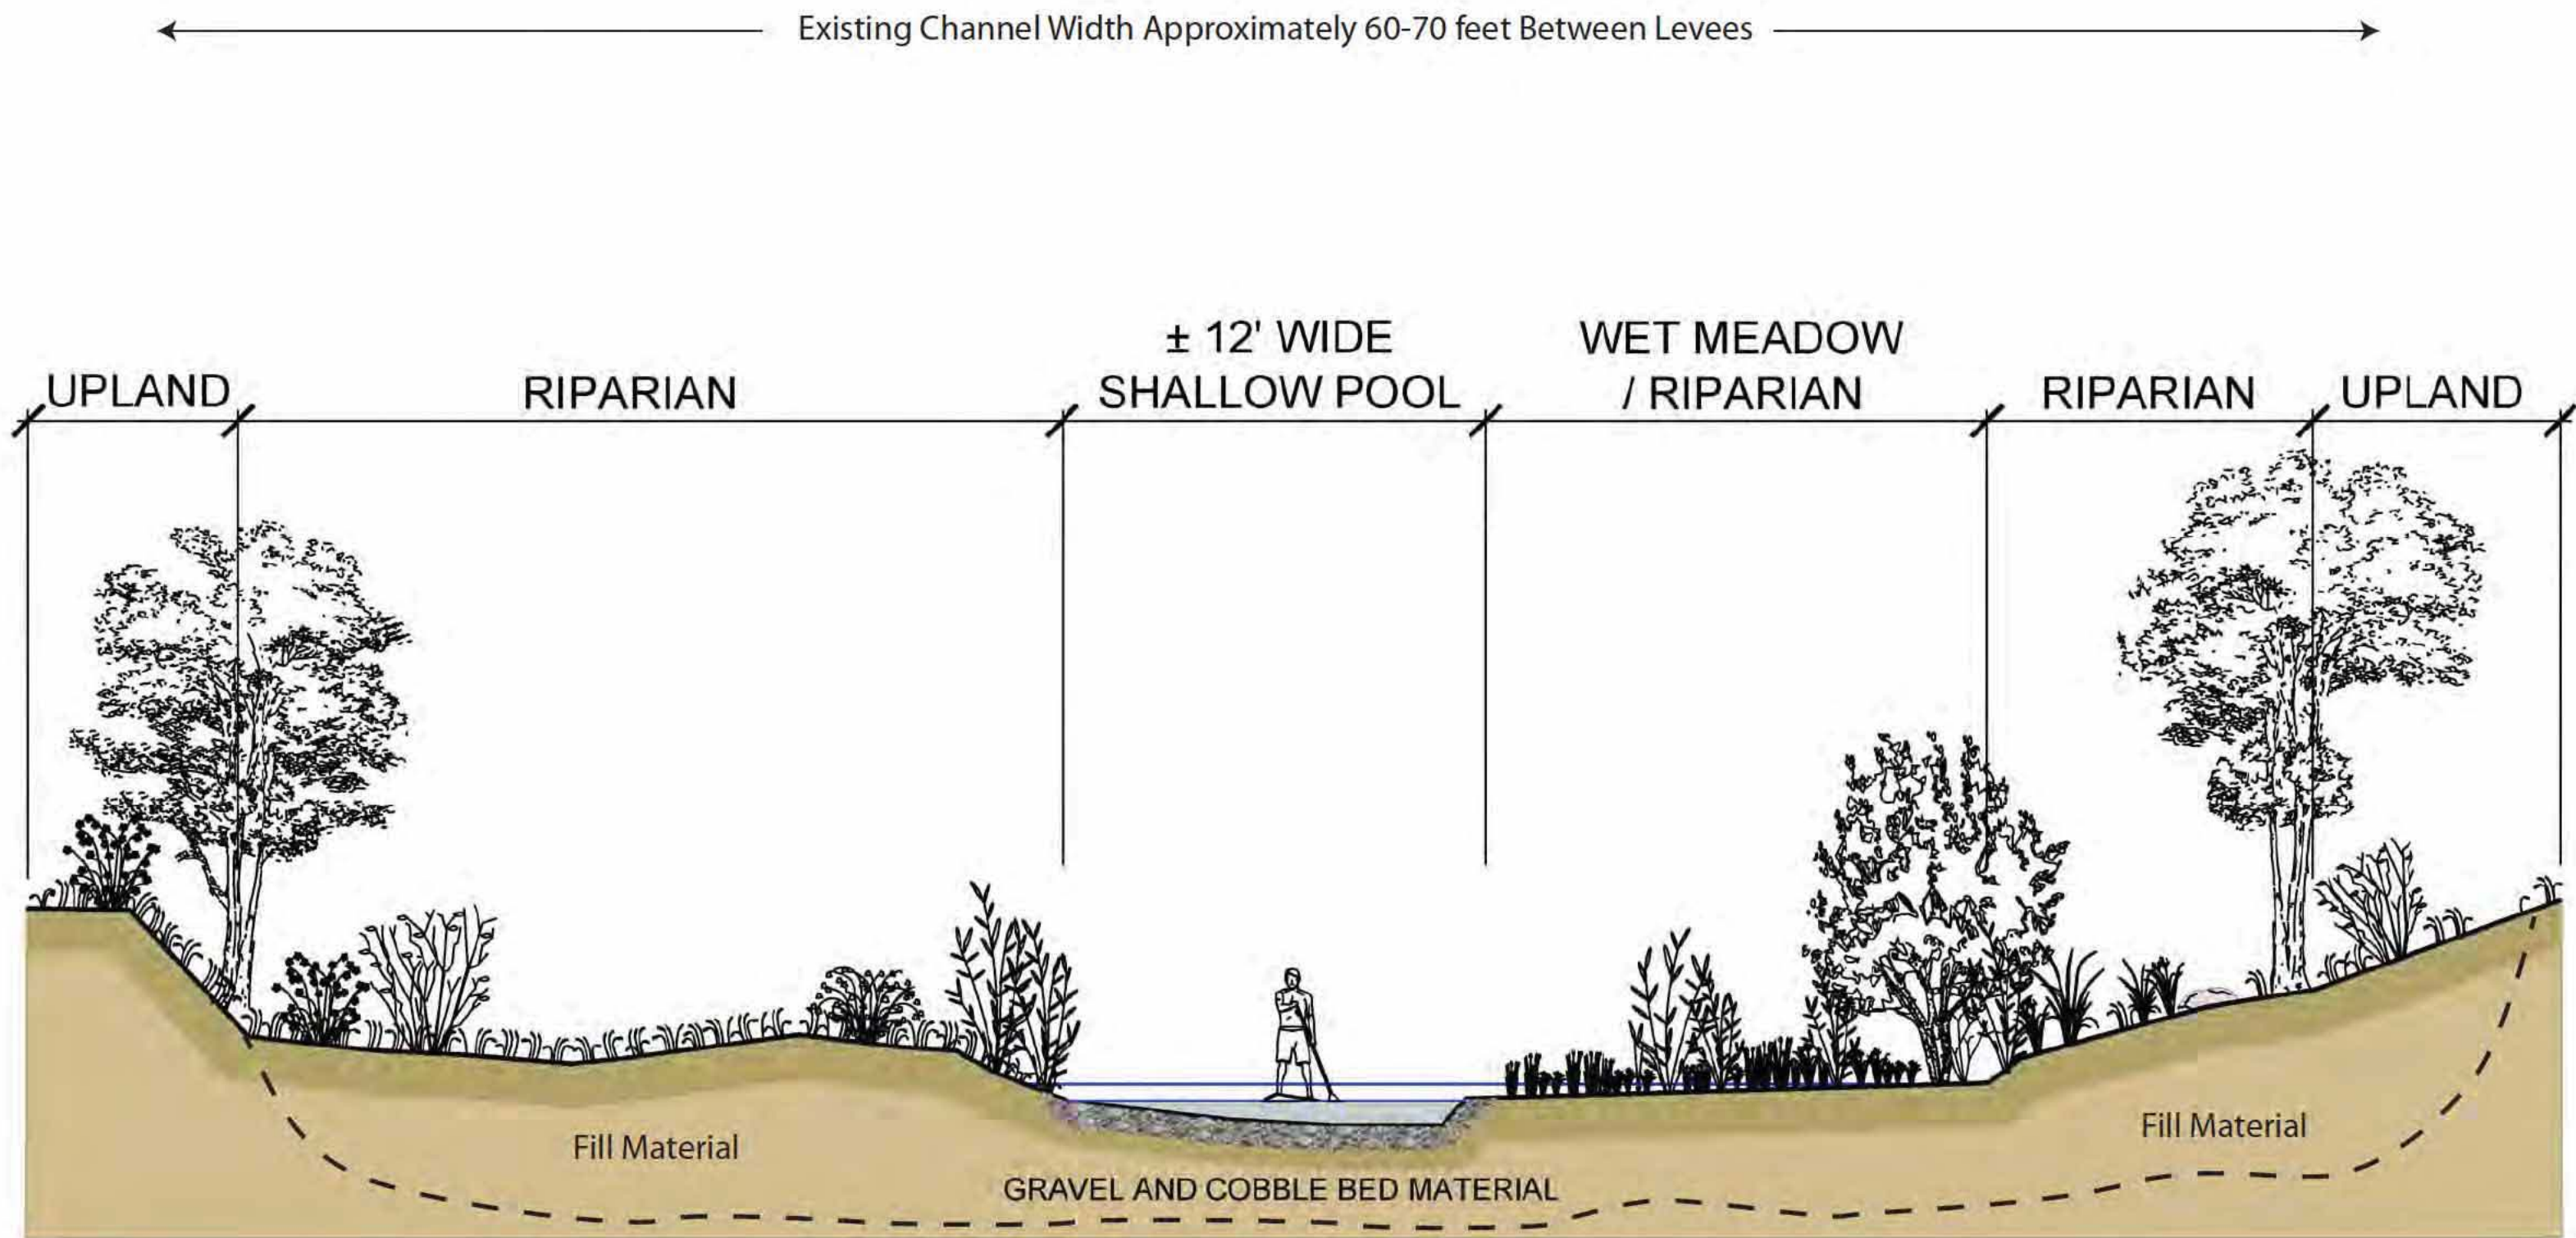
Typical cross-section view of the shallow flowing channel that will be constructed between the levees on the existing Provo River channel.
